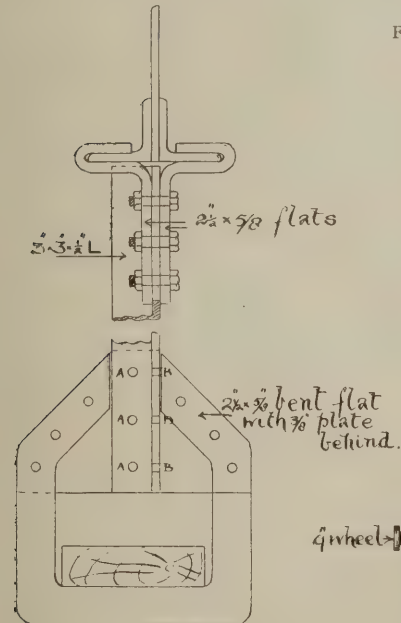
Hanger for Supporting Planks Laid Flat and Carrying Cross Planks.
